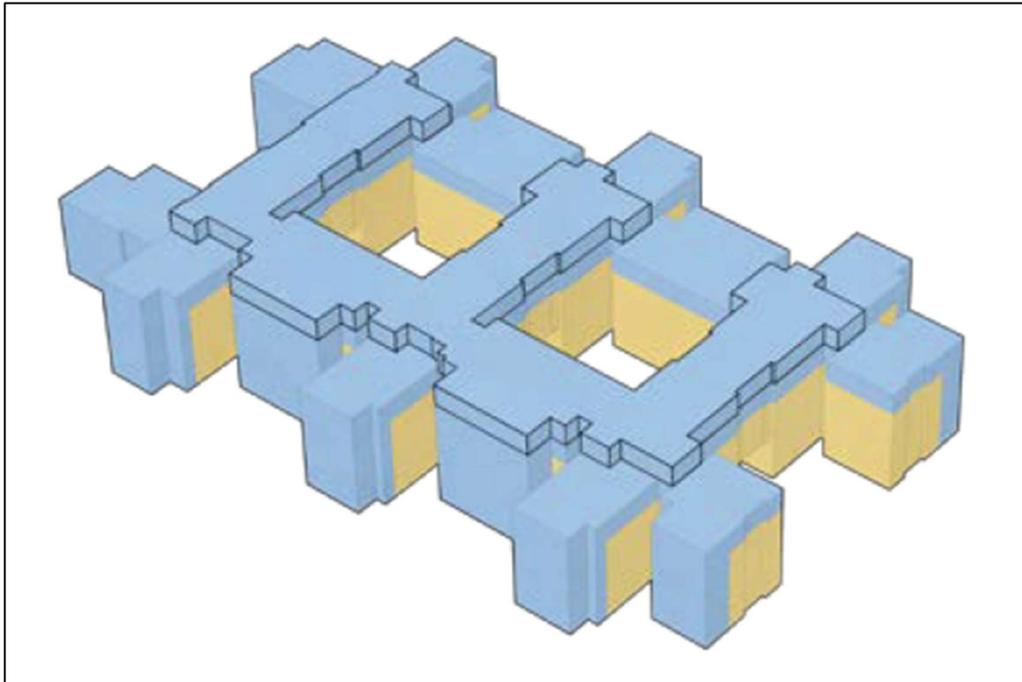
Stage No. 5-Additional set-back 5th Floor added and the creation of new roof levels.
